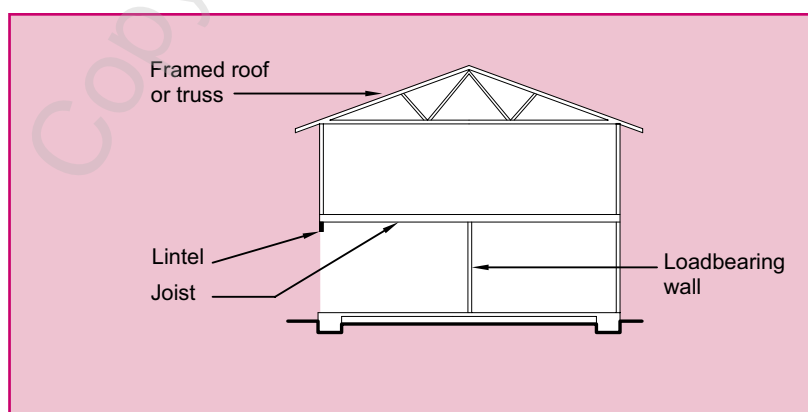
Lintel supporting roof, floor joists and wall (see 8.6.1.1 and table 8.11)
